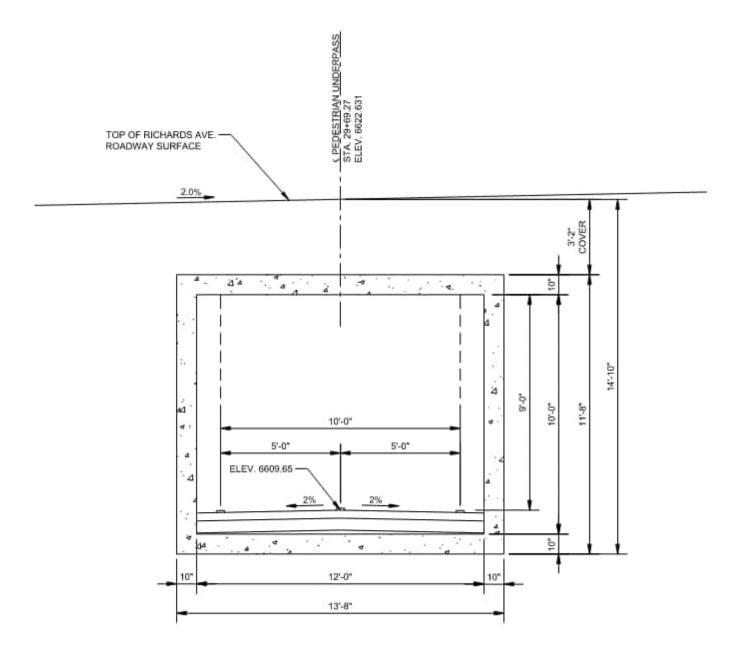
Alternative 2 - Reinforced Concrete Box Typical Section
